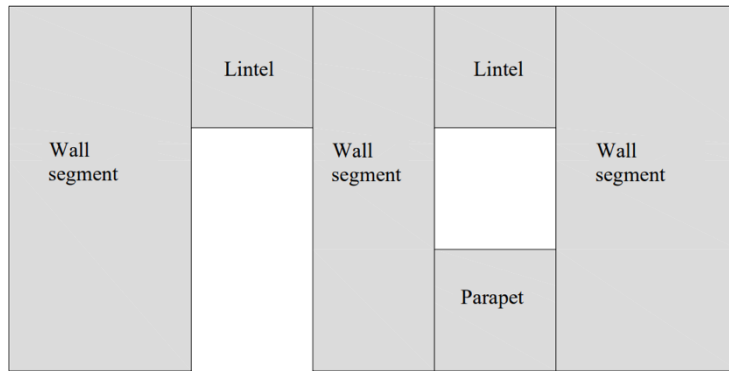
CLT wall, with openings, subdivided into wall segments, lintels, and parapets.
